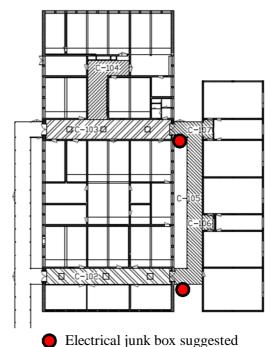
Building C, Plan -1 floor. Shadowed areas correspond to circulation areas.
